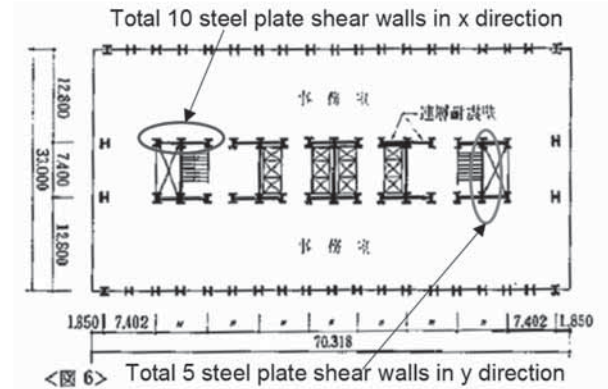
Plan layout of SPW for Nippon Steel Building (Yokoyama et al., 1978).
